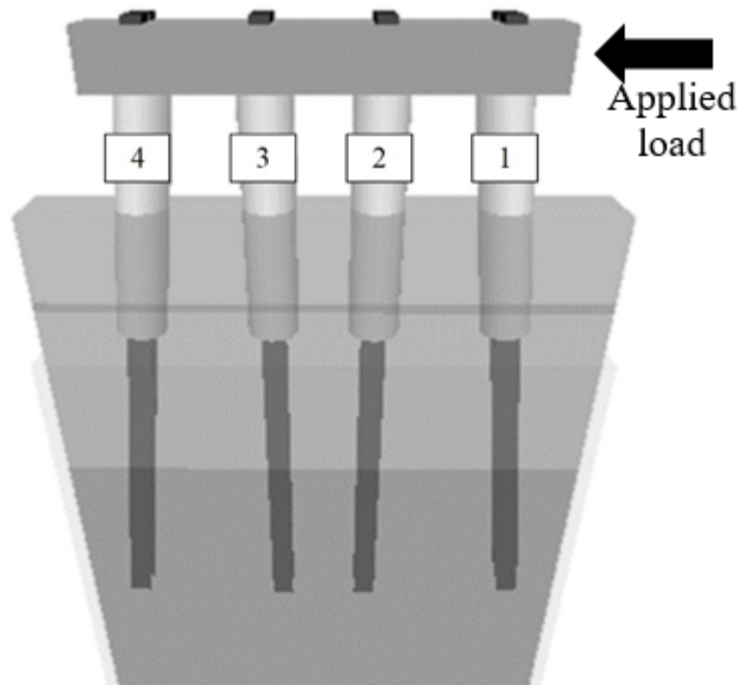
FB Multipier Rendering of Macon County Road 9 Bridge Bent
